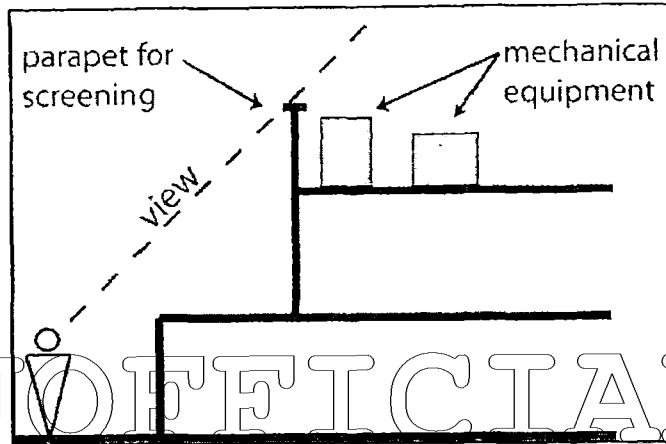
L: Roof mounted mechanical equipment screened by parapets or walls
